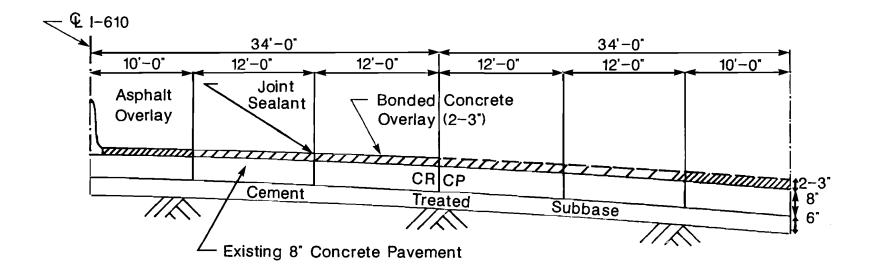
Typical cross section showing detail elements and their dimensions.
